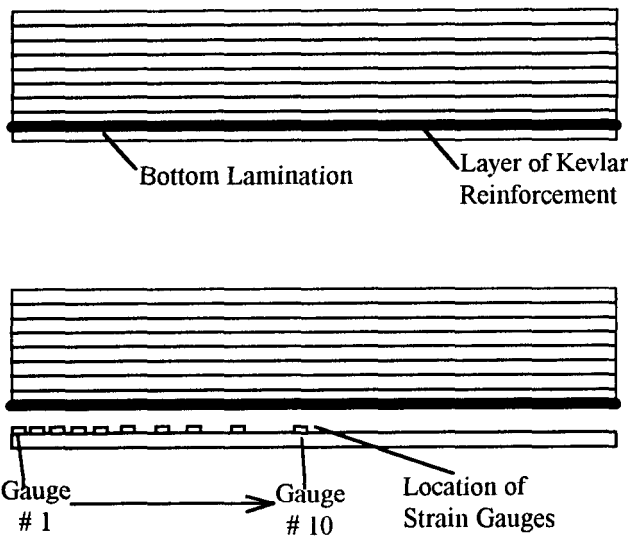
Location of Strain Gauges on Prestressed (P1/T0) Beam.
